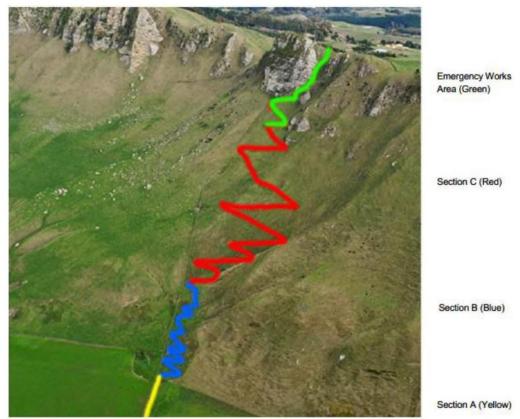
Extent of completed emergency works (in green) and sections of proposed works to remove remaining track"
